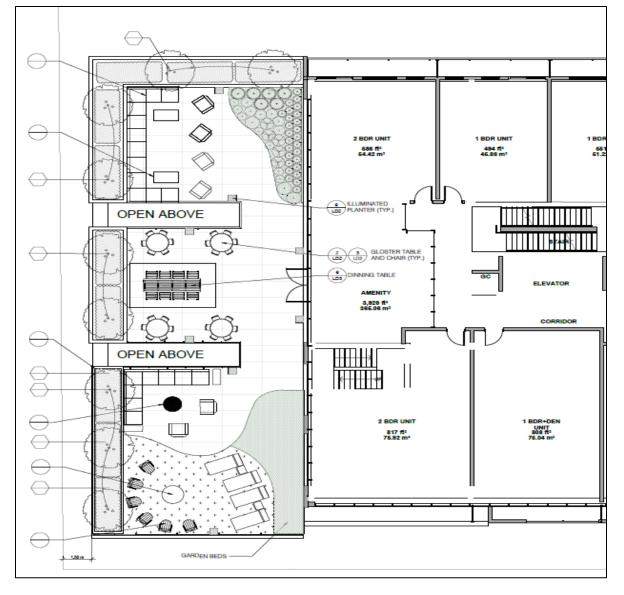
Rooftop Plan 192-196 Central Avenue (January 2024)
